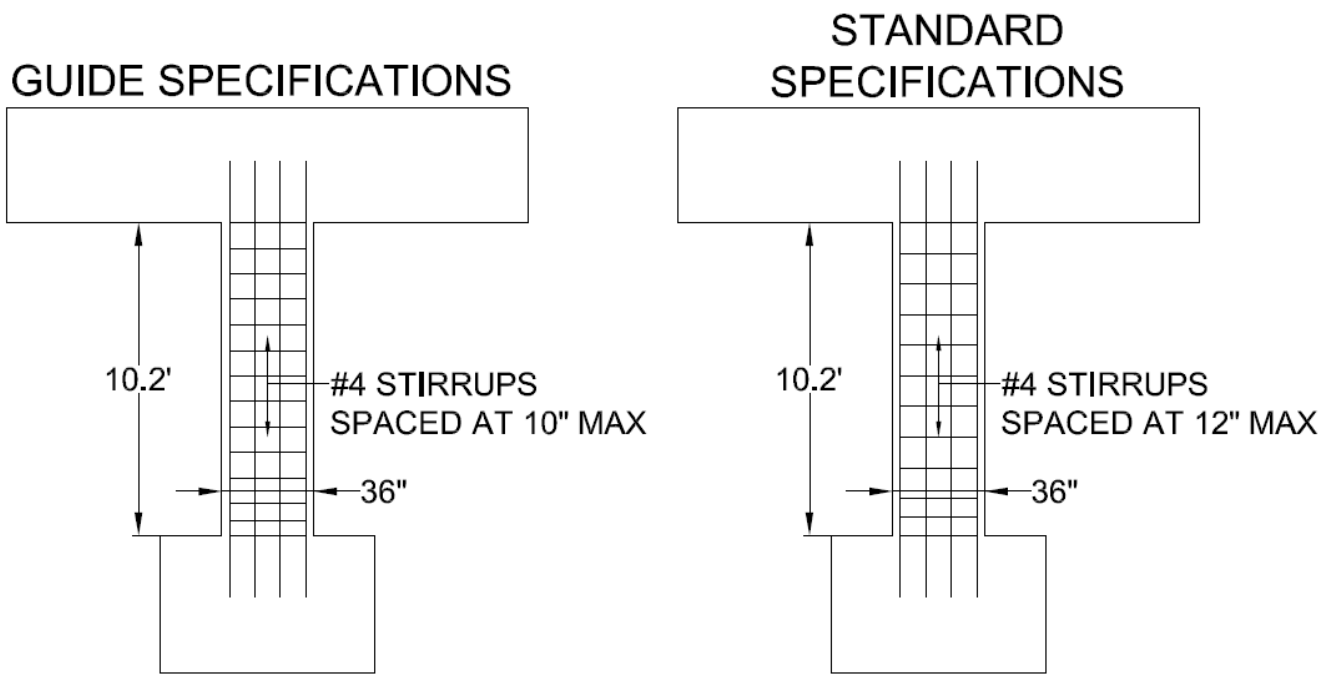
Stave Creek Bridge Bent 2 Final Design Details (SDC A1)
